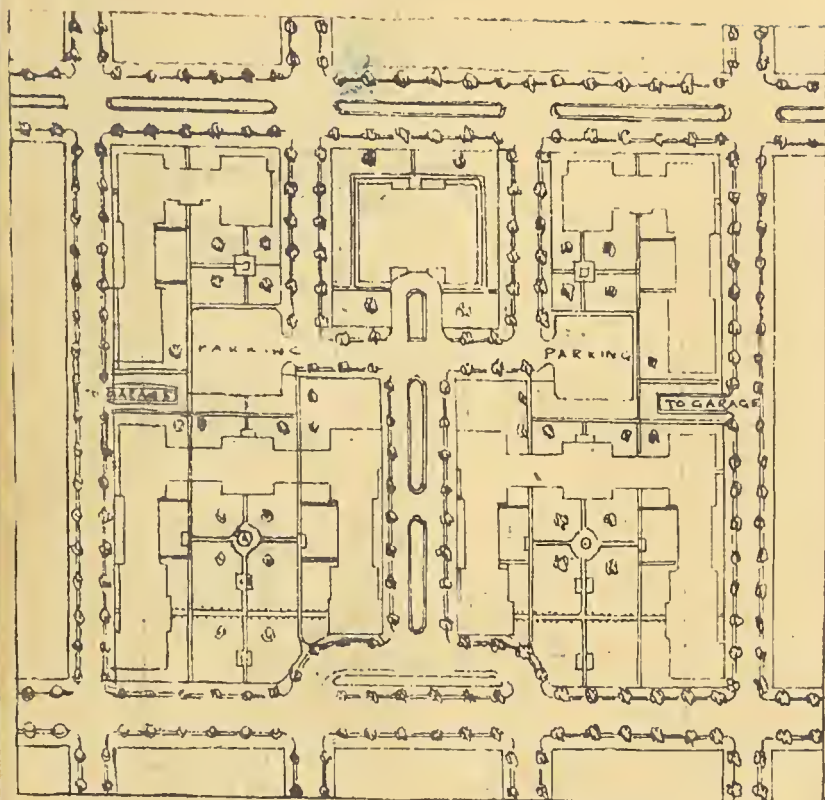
AN ATTRACTIVE LAY-OUT FOR FLATS OR APARTMENT HOUSES.
